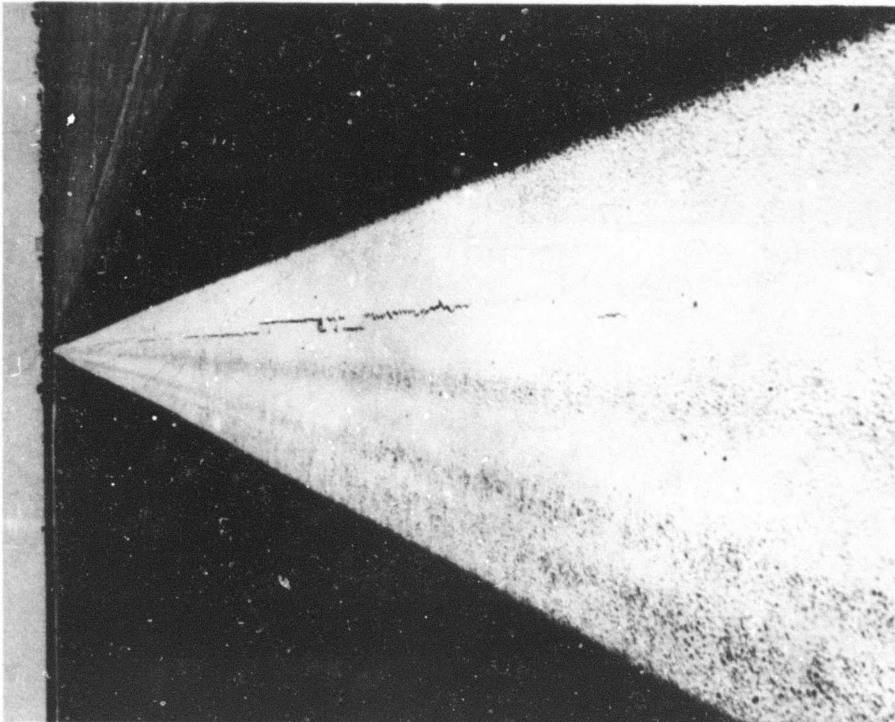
Striping on Runway 8-26, MCAS, Yuma, in October 1968. Note long crack parallel to direction of striping.
